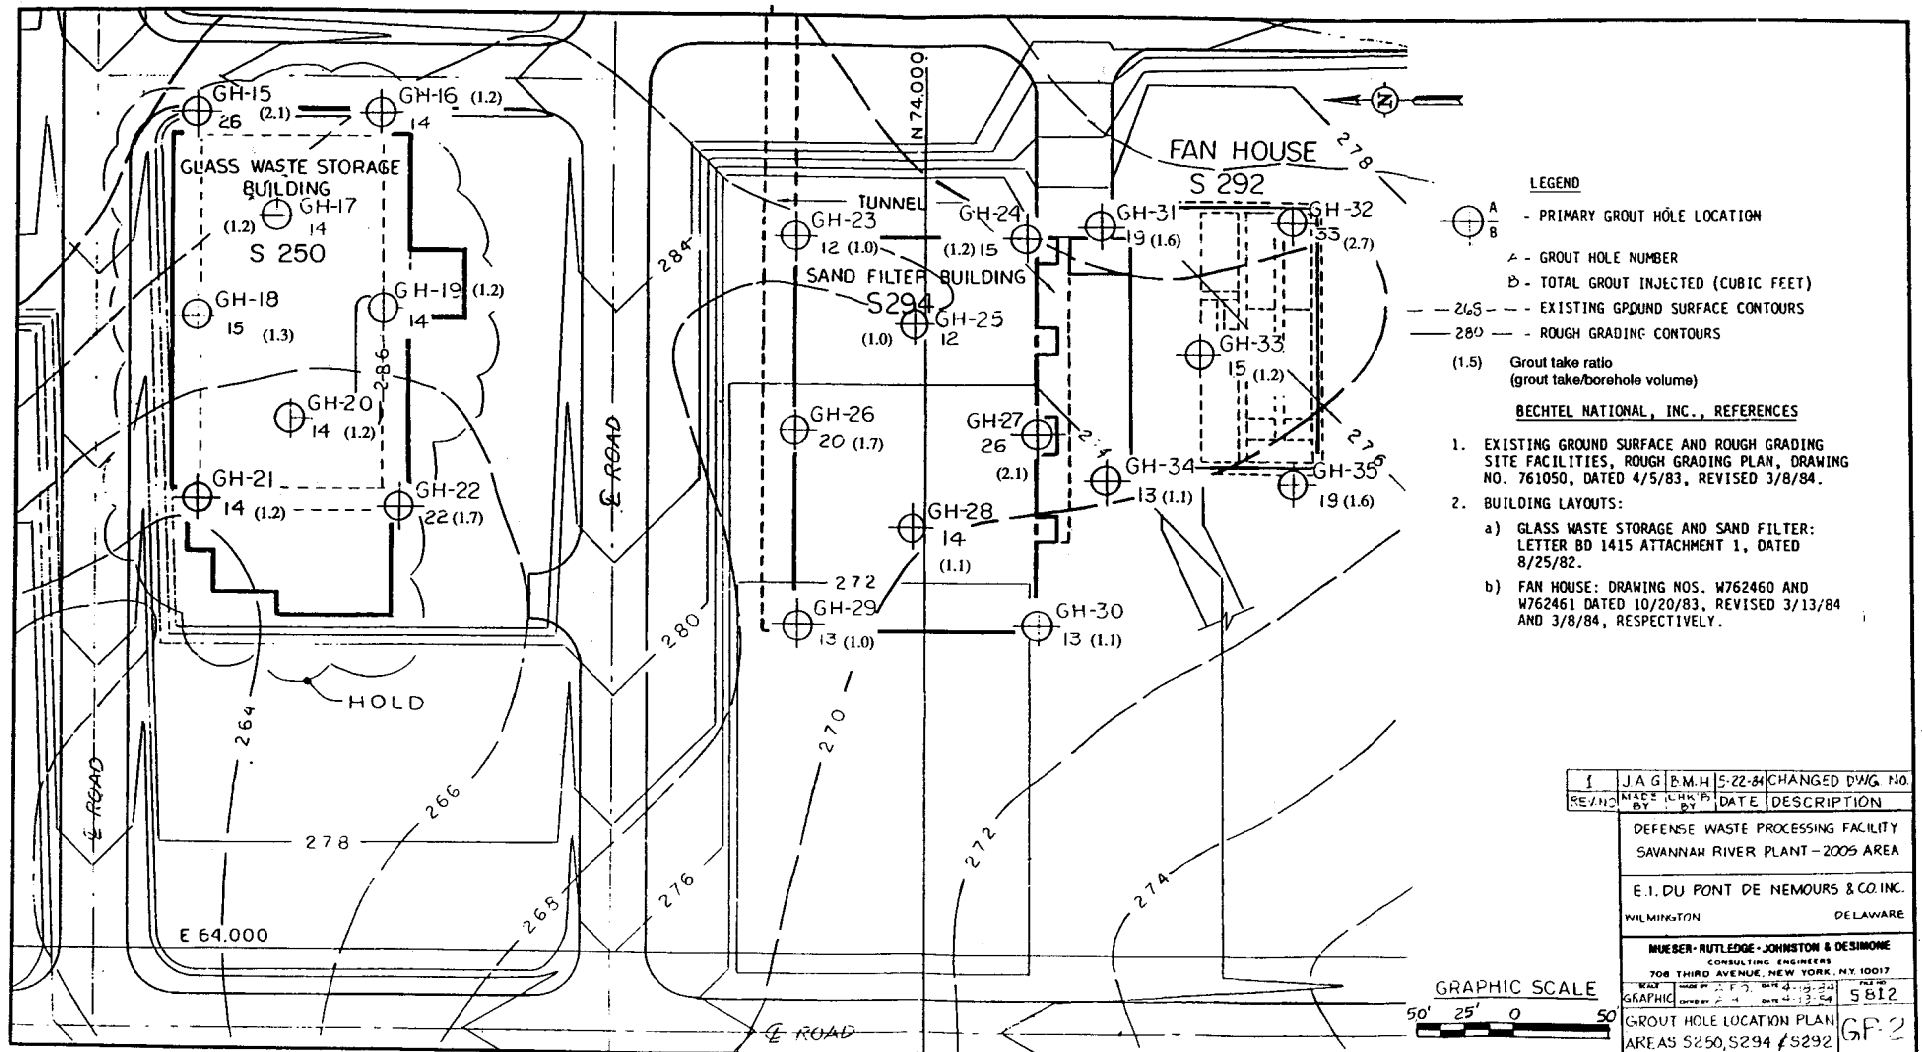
Grout Hole Location Plan and Grout Takes for Various S-Area Buildings.
